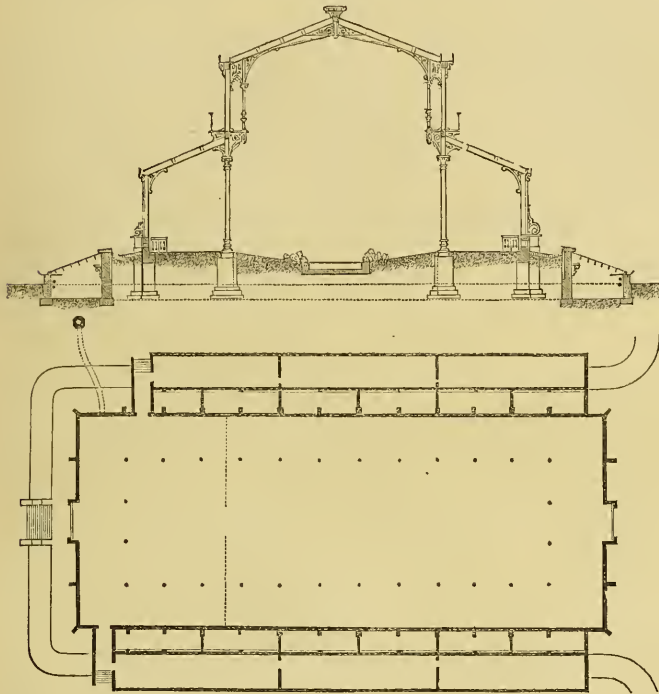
SECTION AND GROUND PLAN OF THE COMTE DE KERCHOVE'S WINTER GARDEN AT GHENT.
